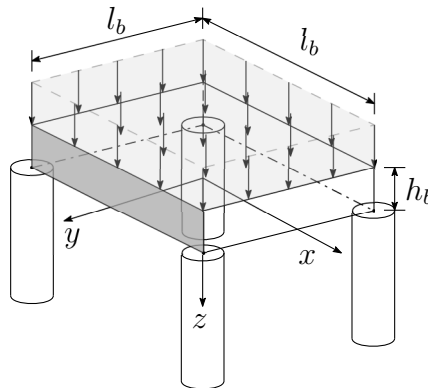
Frontal plane of a structure submitted to a vertical load
